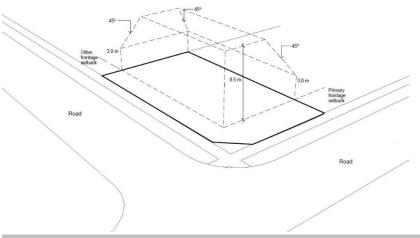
Building envelope for corner lots as required by clause 10.4.2 A3(a)
